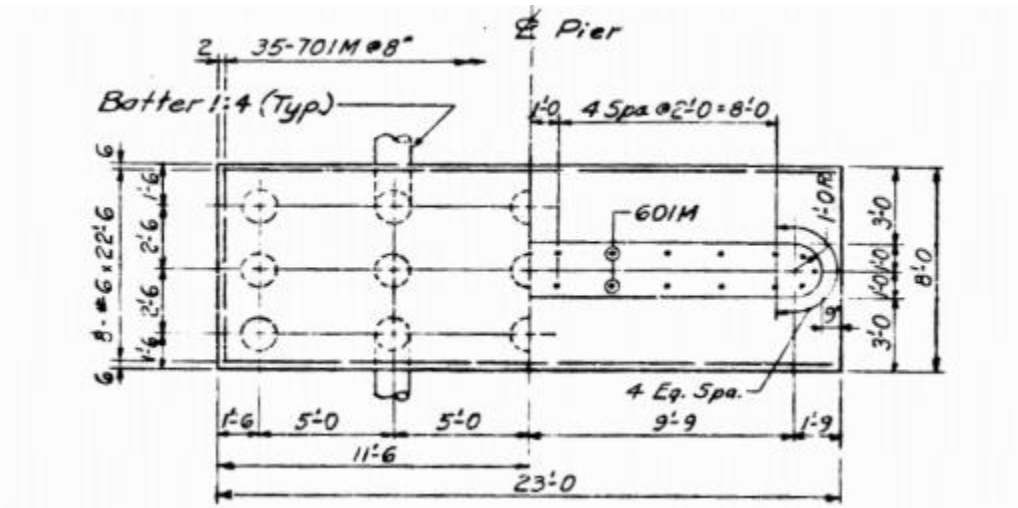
System C: Cross Section of Typical Interior Pier of the Bridge (NBI 33240) (1986)
